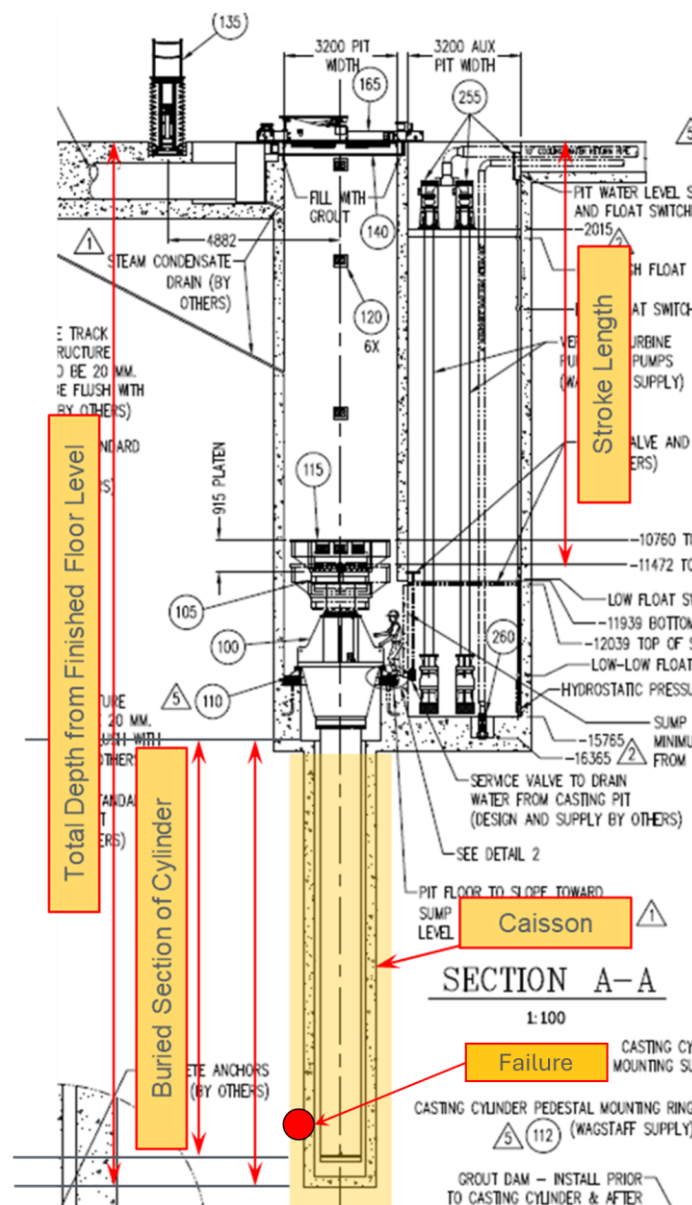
General arrangement of Vertical Direct Chilled Casting (VDC) facilities.
